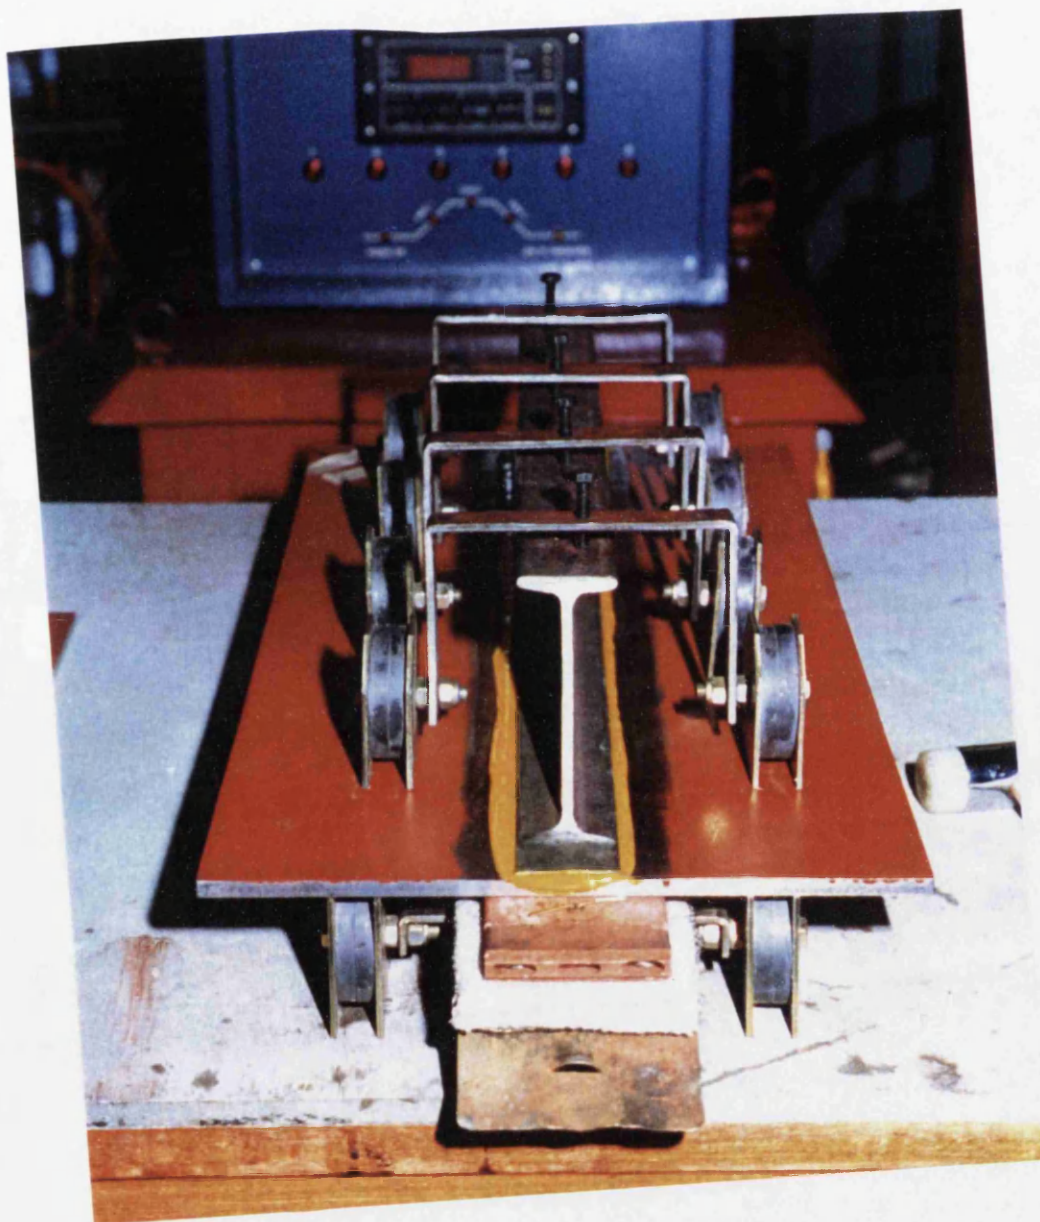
CLAMPED STEEL/STEEL SPECIMEN (SHOWING HEATING ELEMENT)
